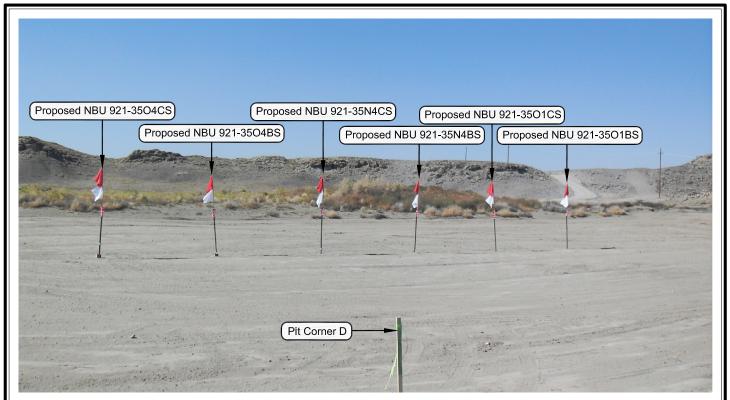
PHOTO VIEW: FROM PIT CORNER D TO LOCATION STAKE
